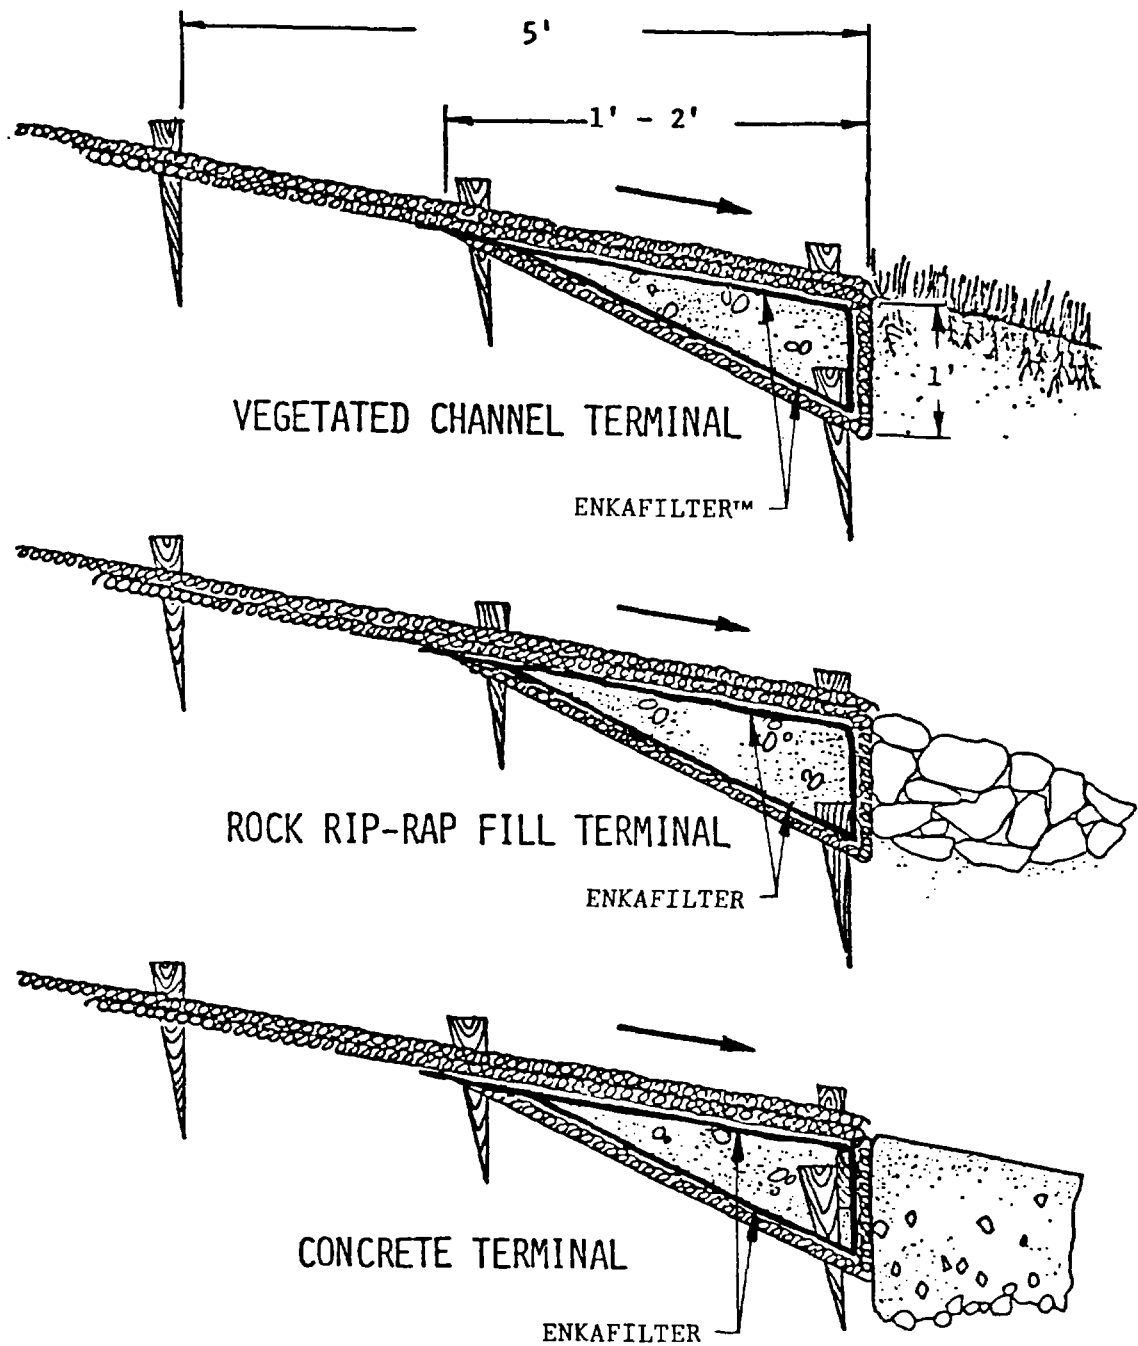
A - INSTALLING ENKAMAT® - REINFORCED CONSTRUCTION
